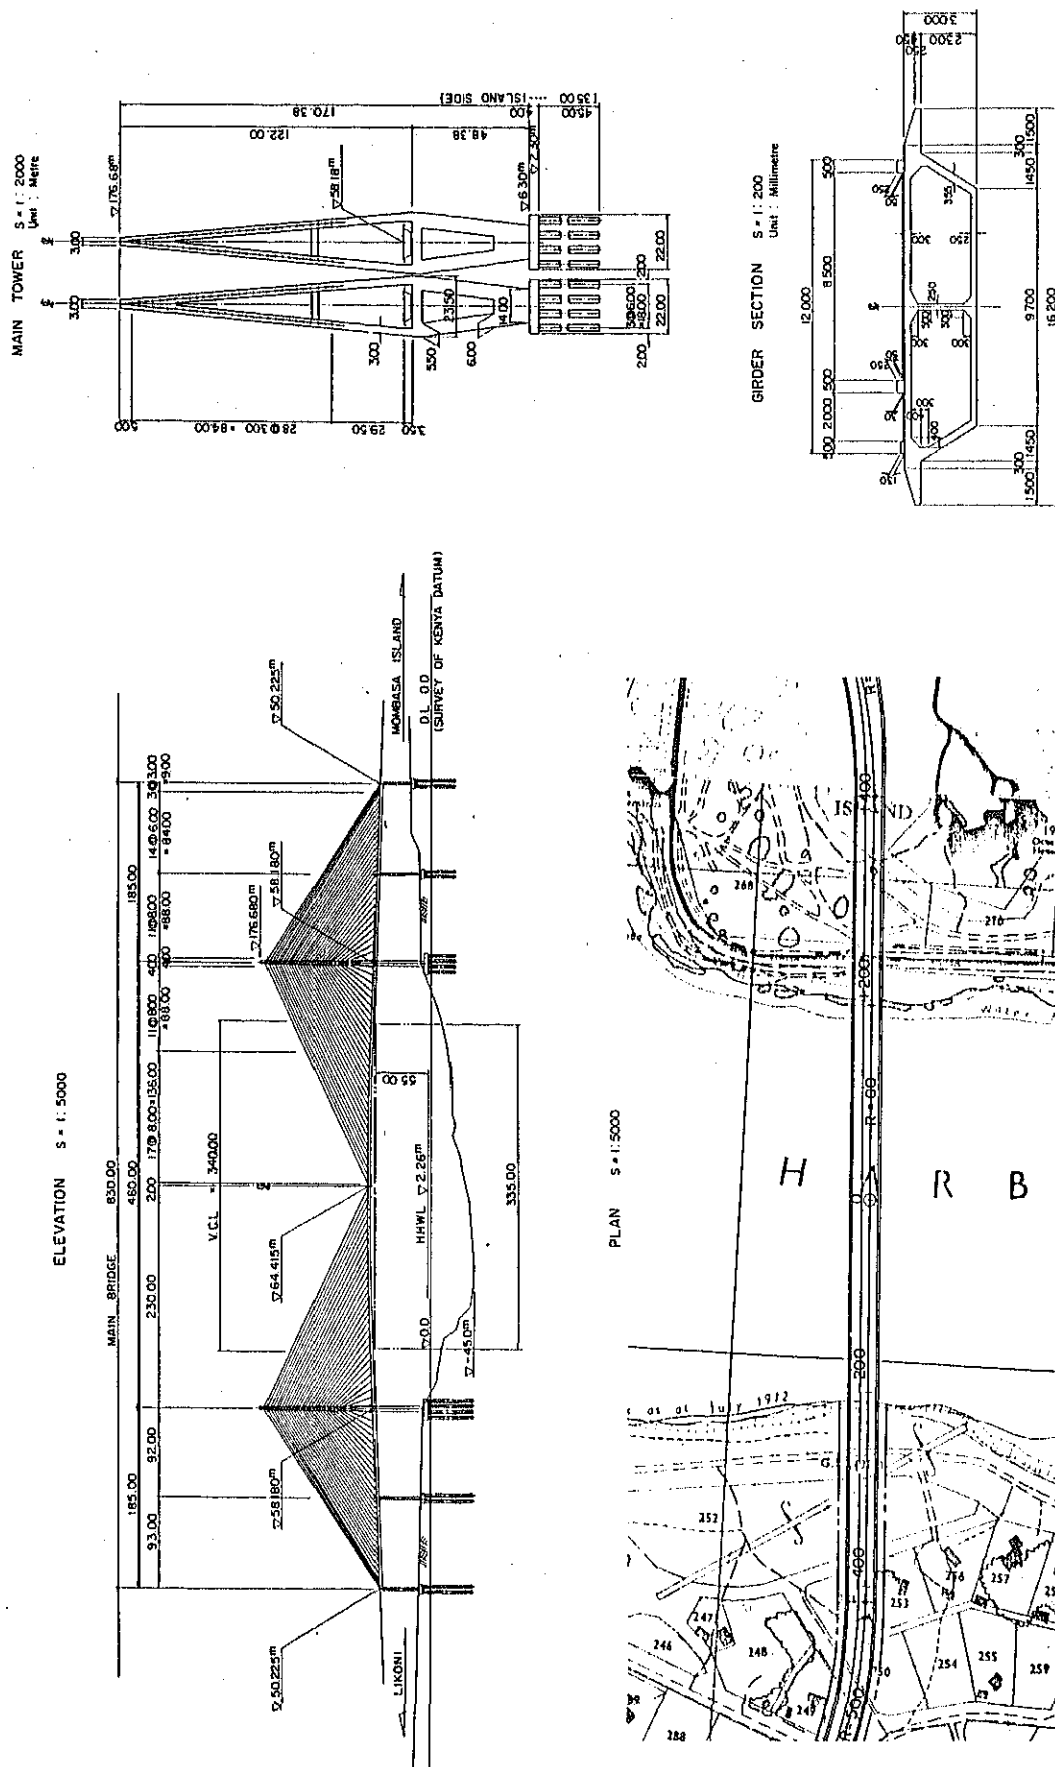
BRIDGE ALTERNATIVE (CABLE STAYED MAIN BRIDGE : H = 55 & 45 m)
